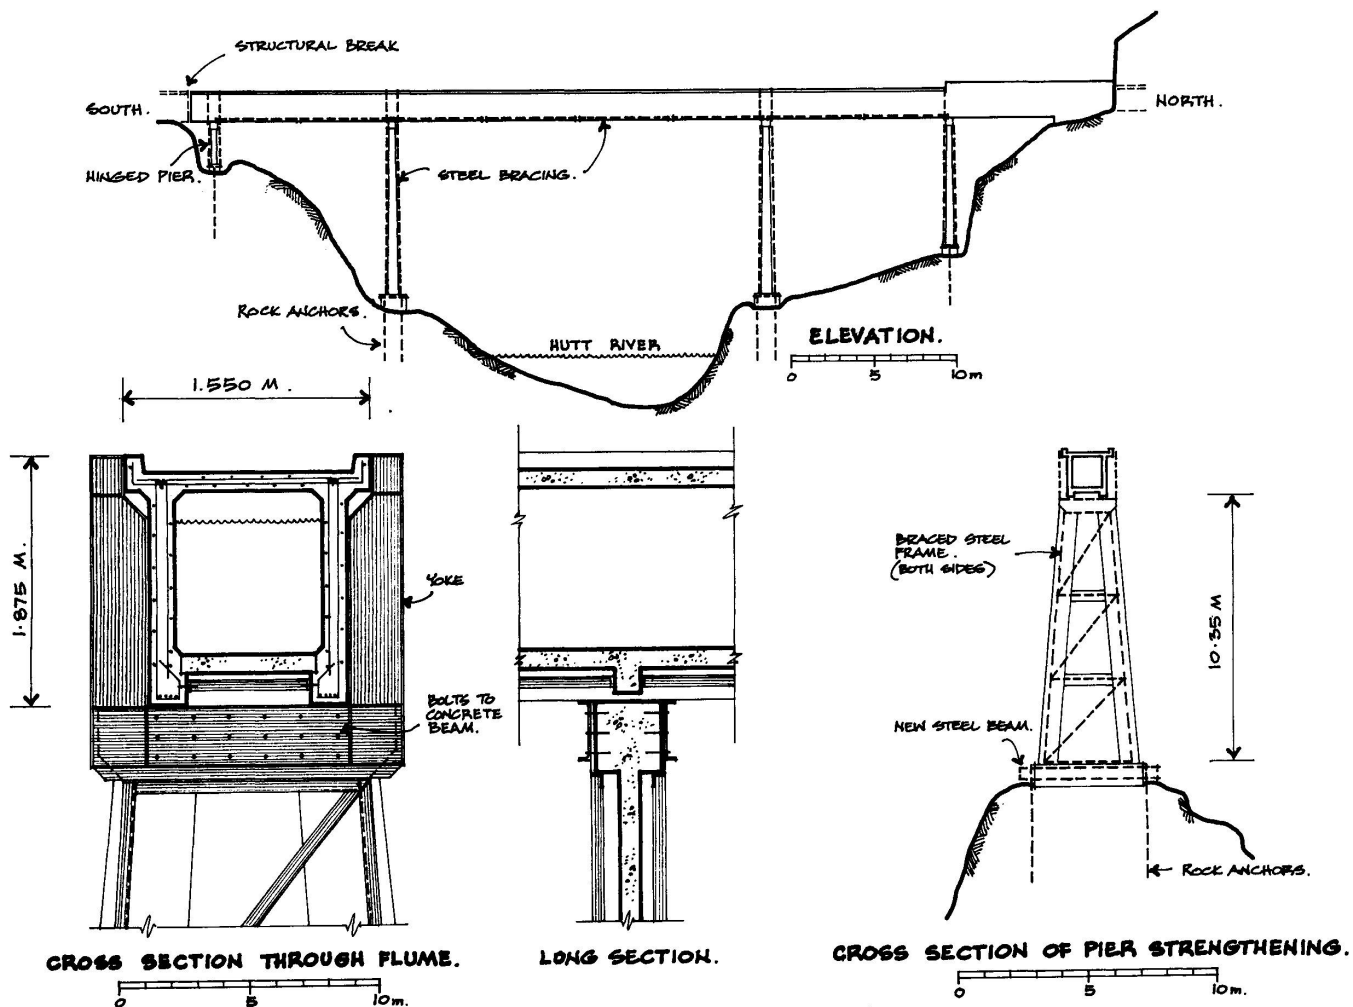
KAITOKE FLUME BRIDGE - STRENGTHENING DETAILS.
